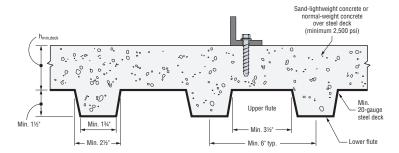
Installation of 1/4"- and %"-Diameter Anchors in the Topside of Concrete over Steel Deck
